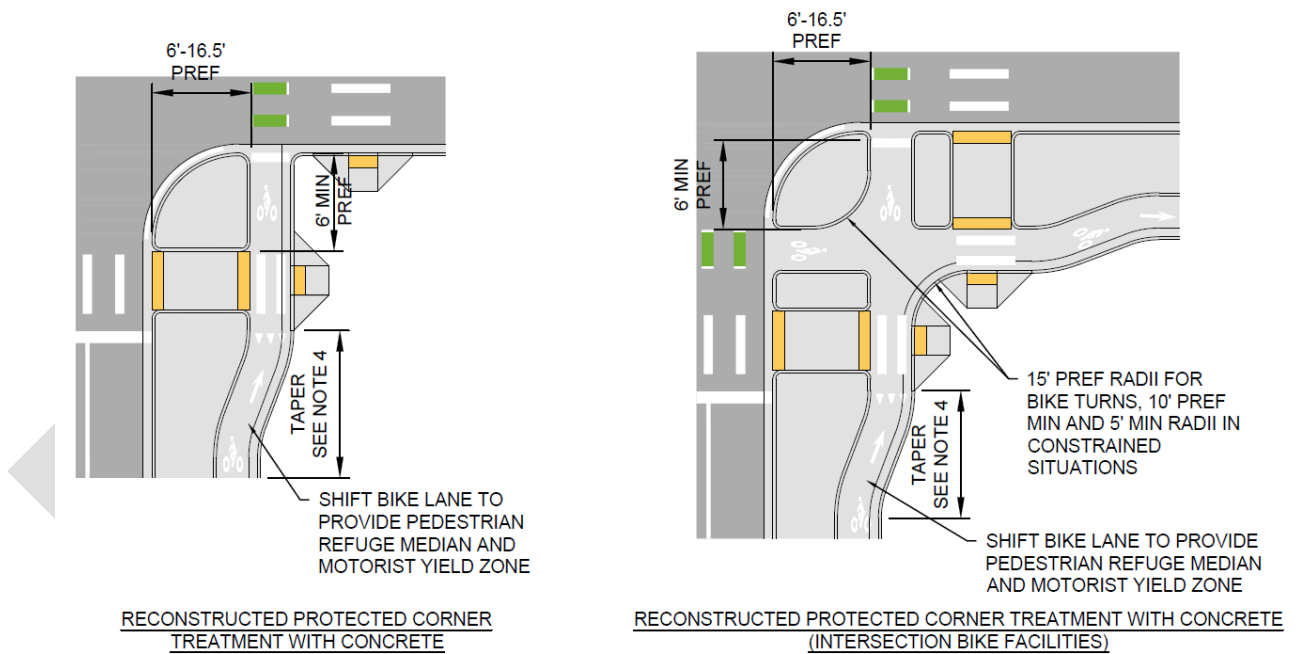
Typical Layout of Street Level Separated Bike Lanes at Intersections in Reconstructed Condition
